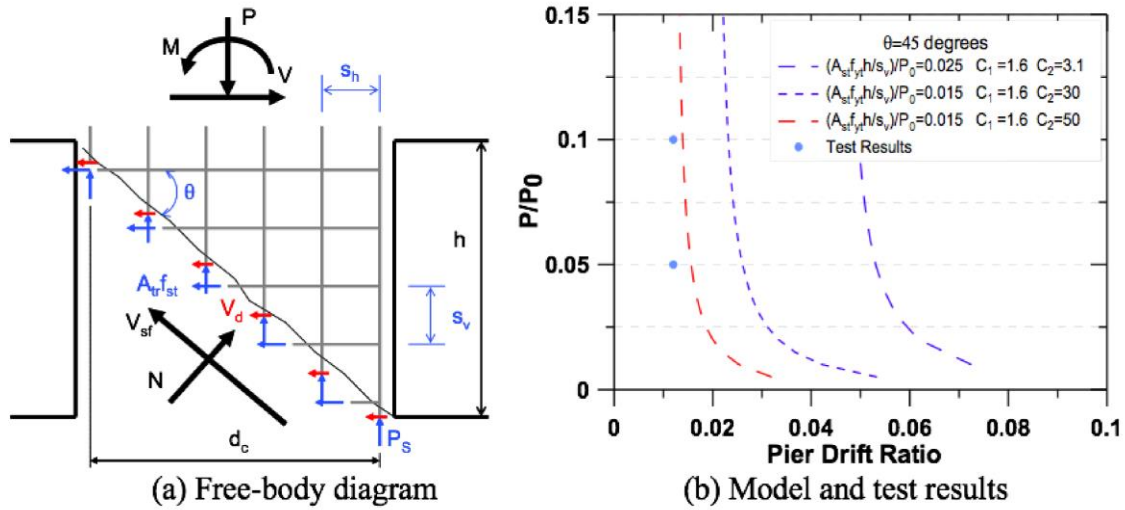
Axial load capacity model for a shear wall pier after diagonal cracking.
